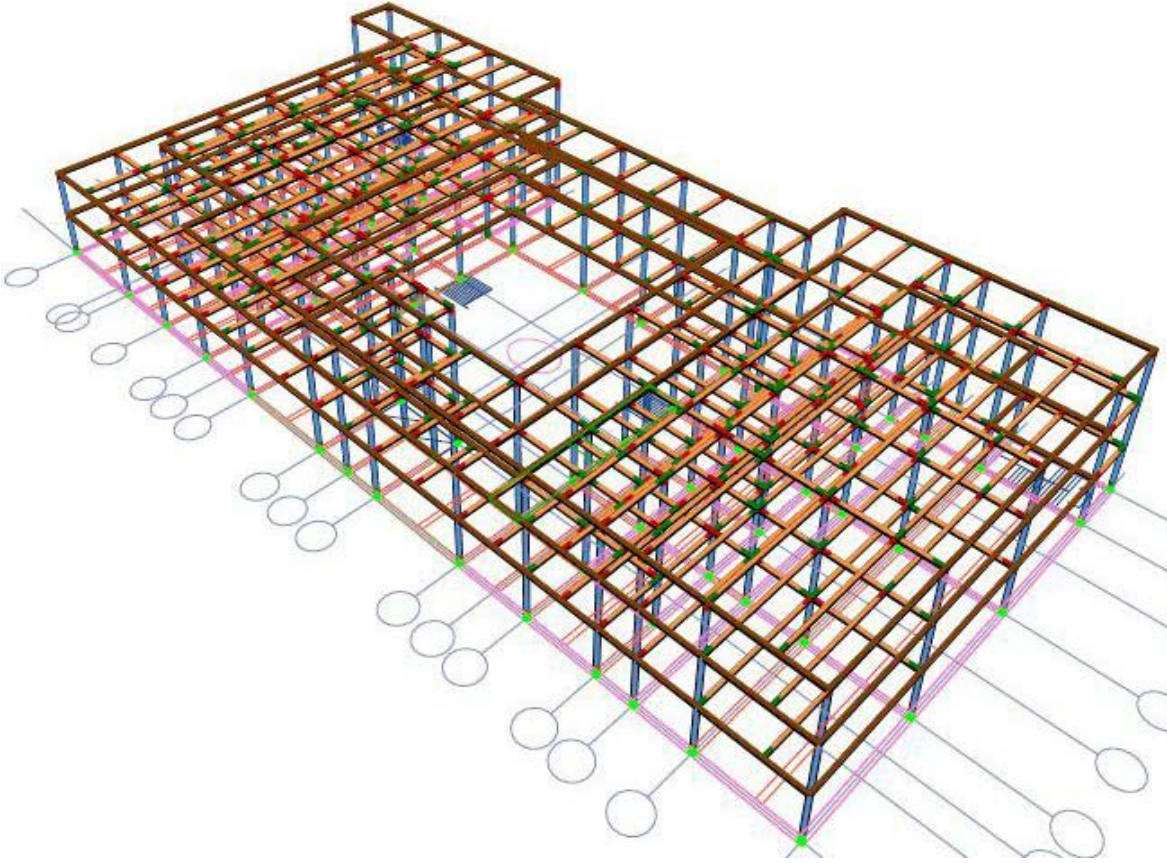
AutoCAD was used to create a 3D view of the beam layout from the south-west
